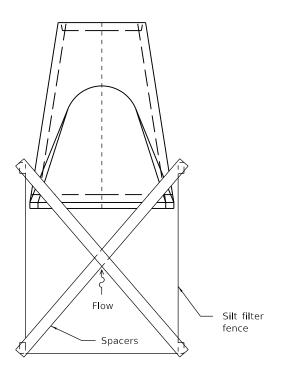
, TYPICAL PROFILE, NOT TO SCALE
